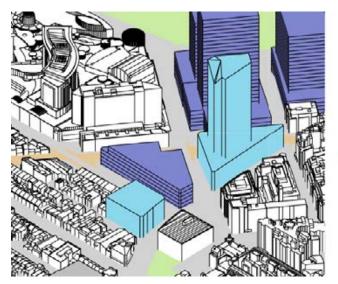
location plan of 13A-29 Union Street & 69-72 Edward Street
